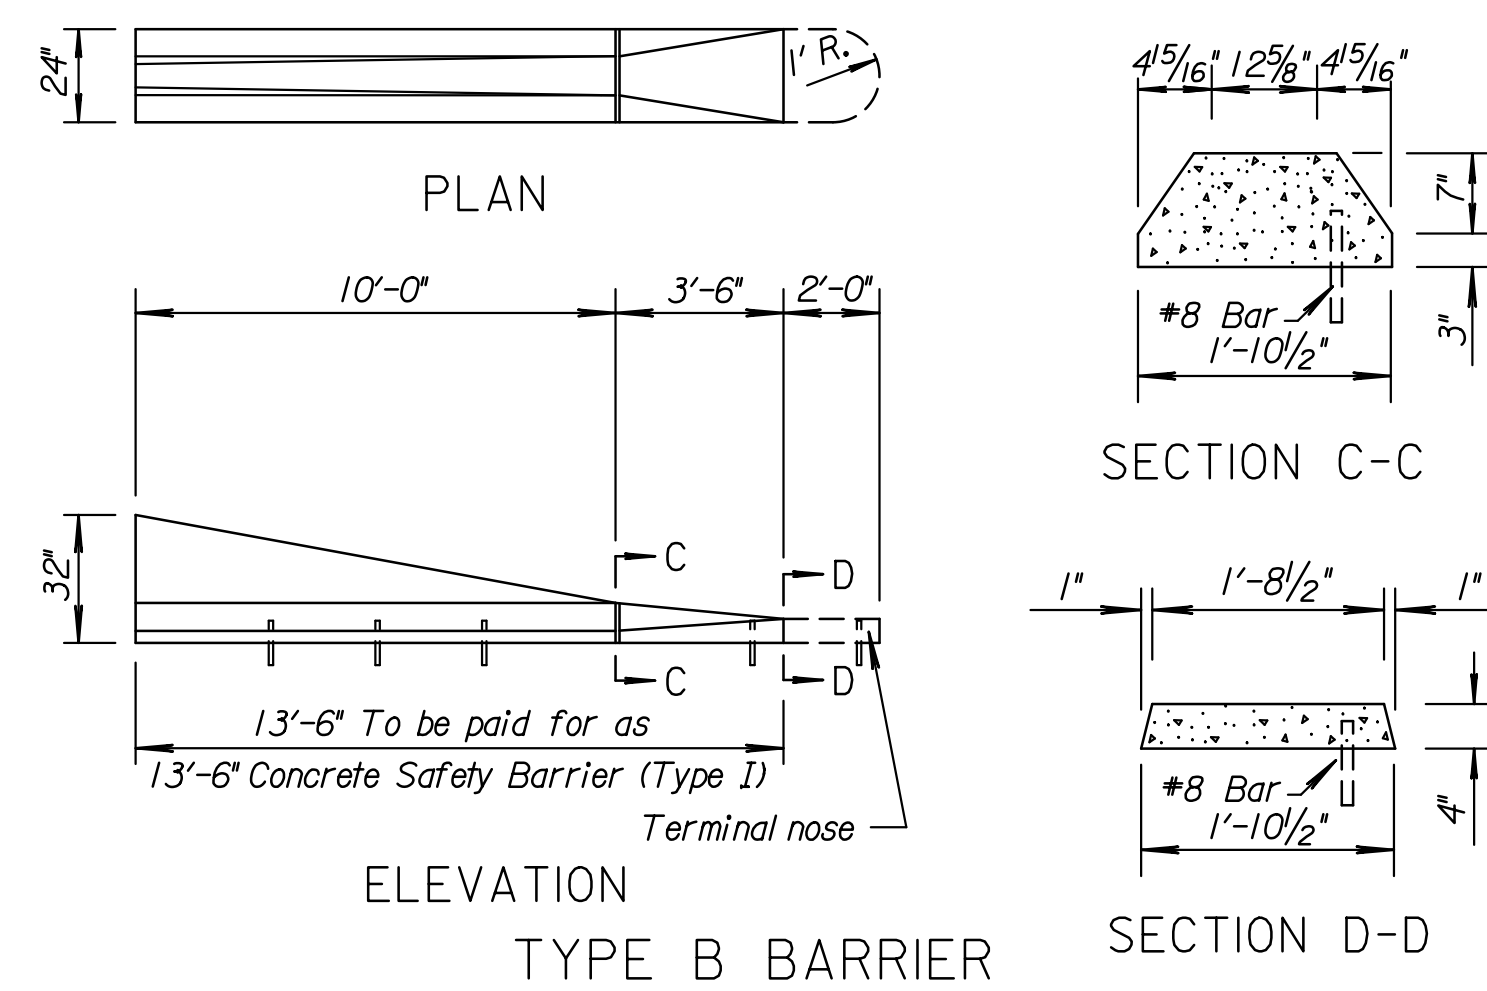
DETAIL FOR BRIDGE WITHOUT SAFETY TYPE RAIL
